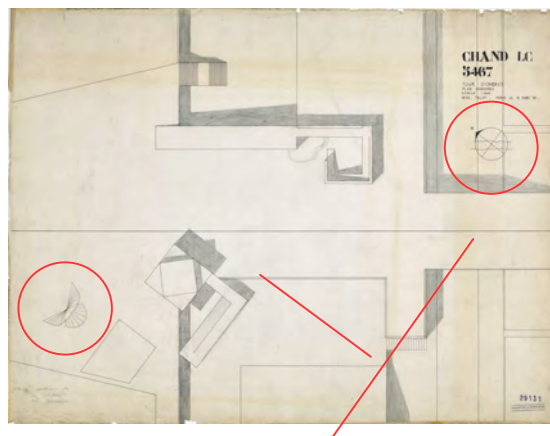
Site Plan for Tower of Shadows (original drawing from LCF, modified with remarks).
